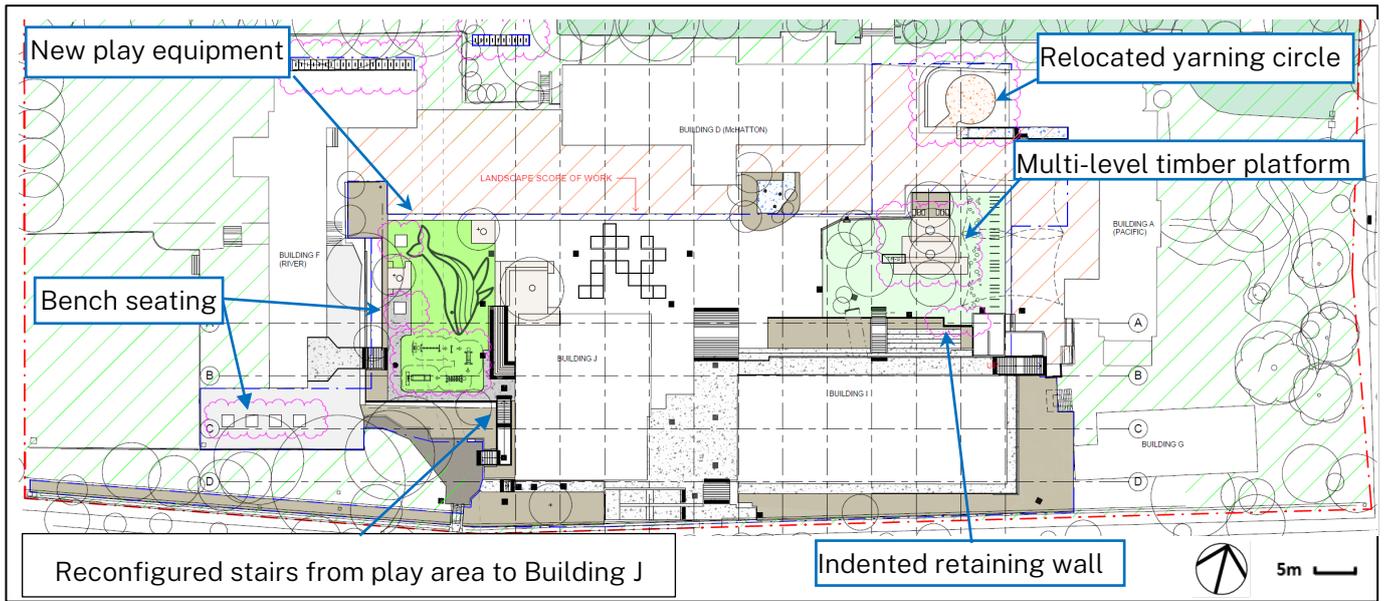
| Proposed modification to landscape plan (Base Source: Modification 3, 2023)
